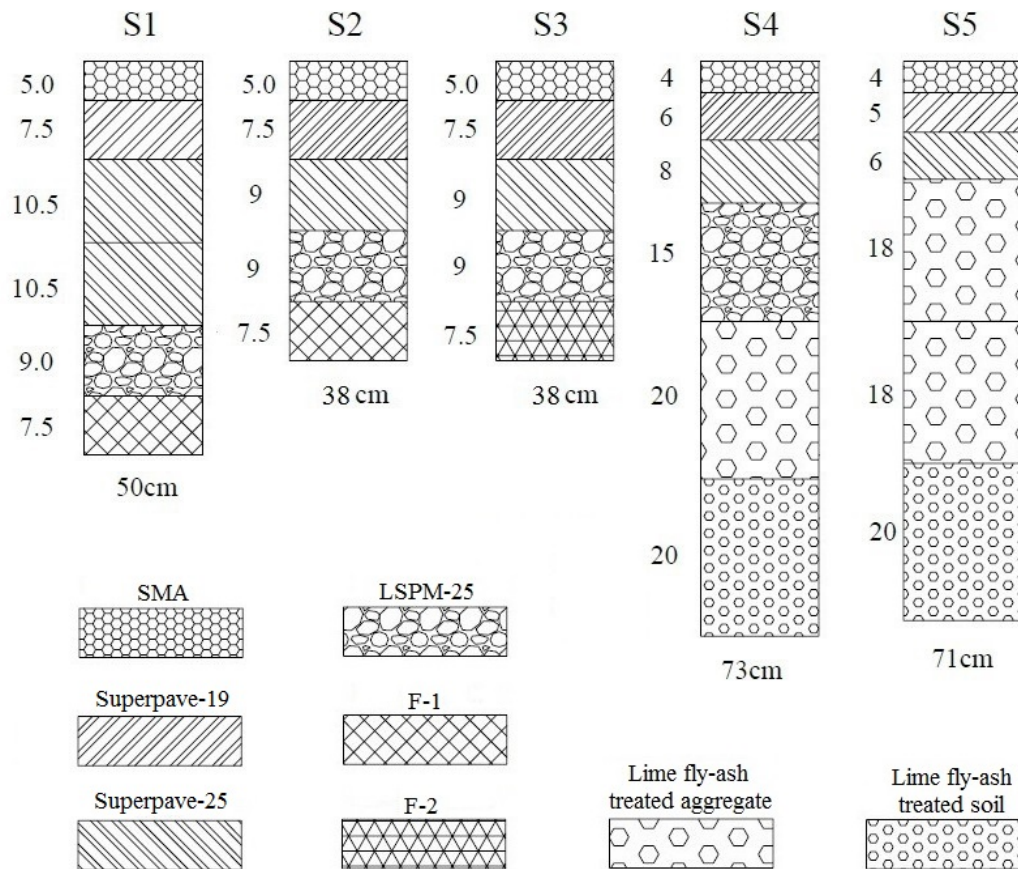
Structure layout of test sections in Binzhou perpetual pavement project.
